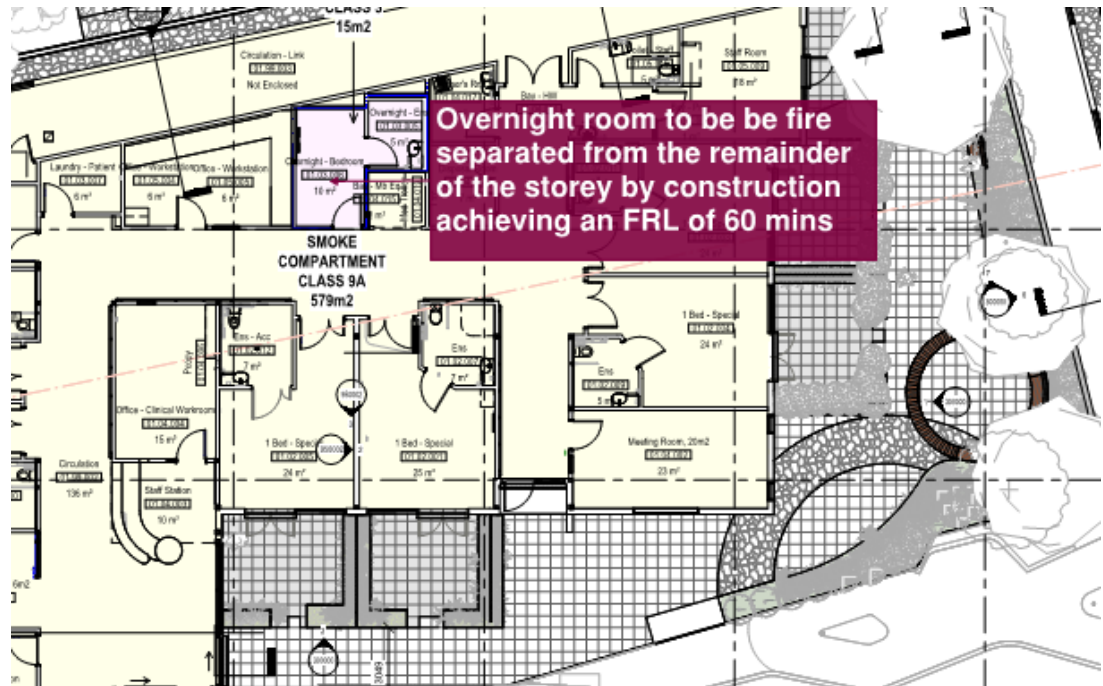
Overnight room located within Palliative Care to be fire separated from the remainder of the floor
